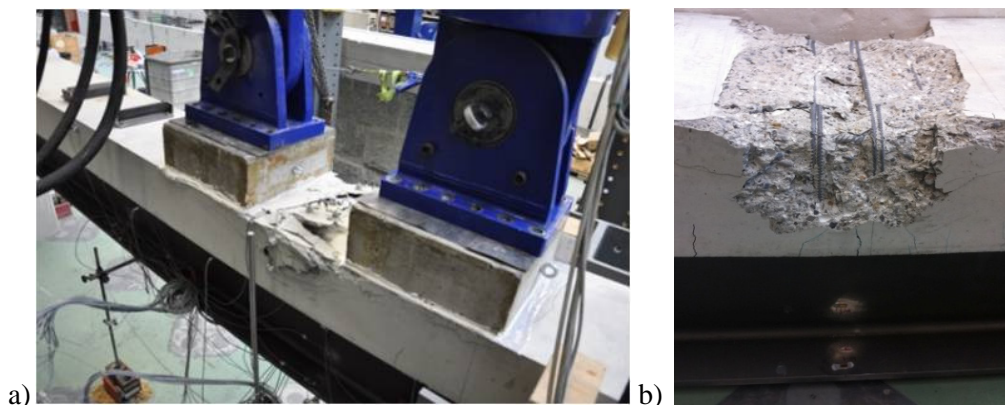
Spawling of concrete outside the stirrups at middle of span a) general view b) detail view after unloading and removing of failed material
